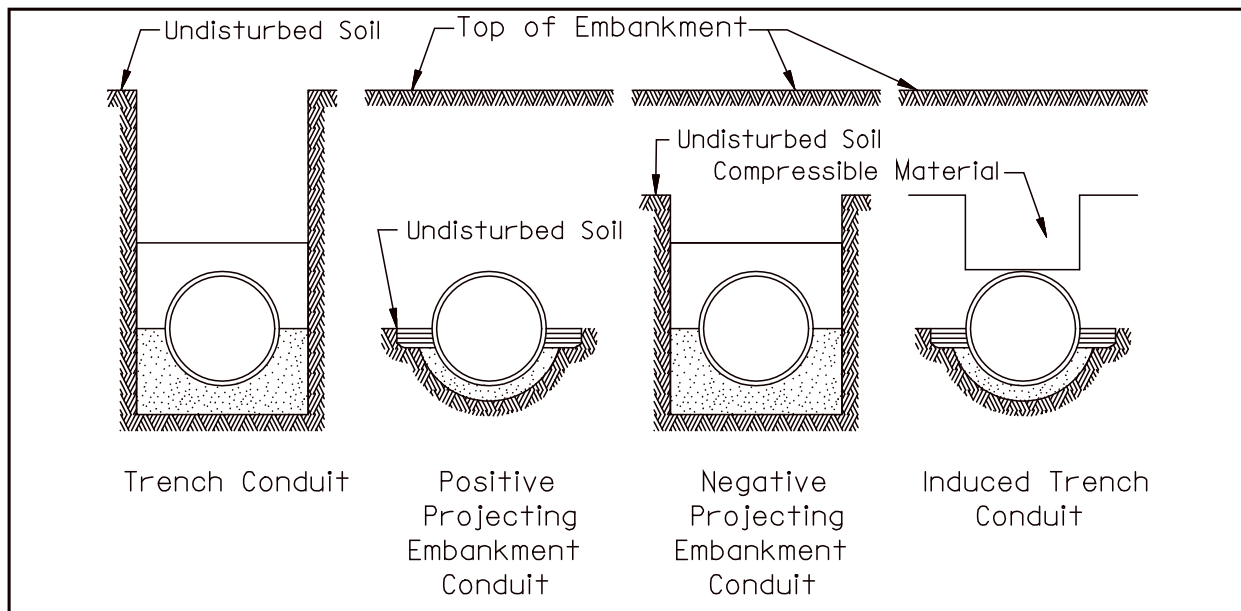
Features of the Various Types of Underground Conduit Installations
